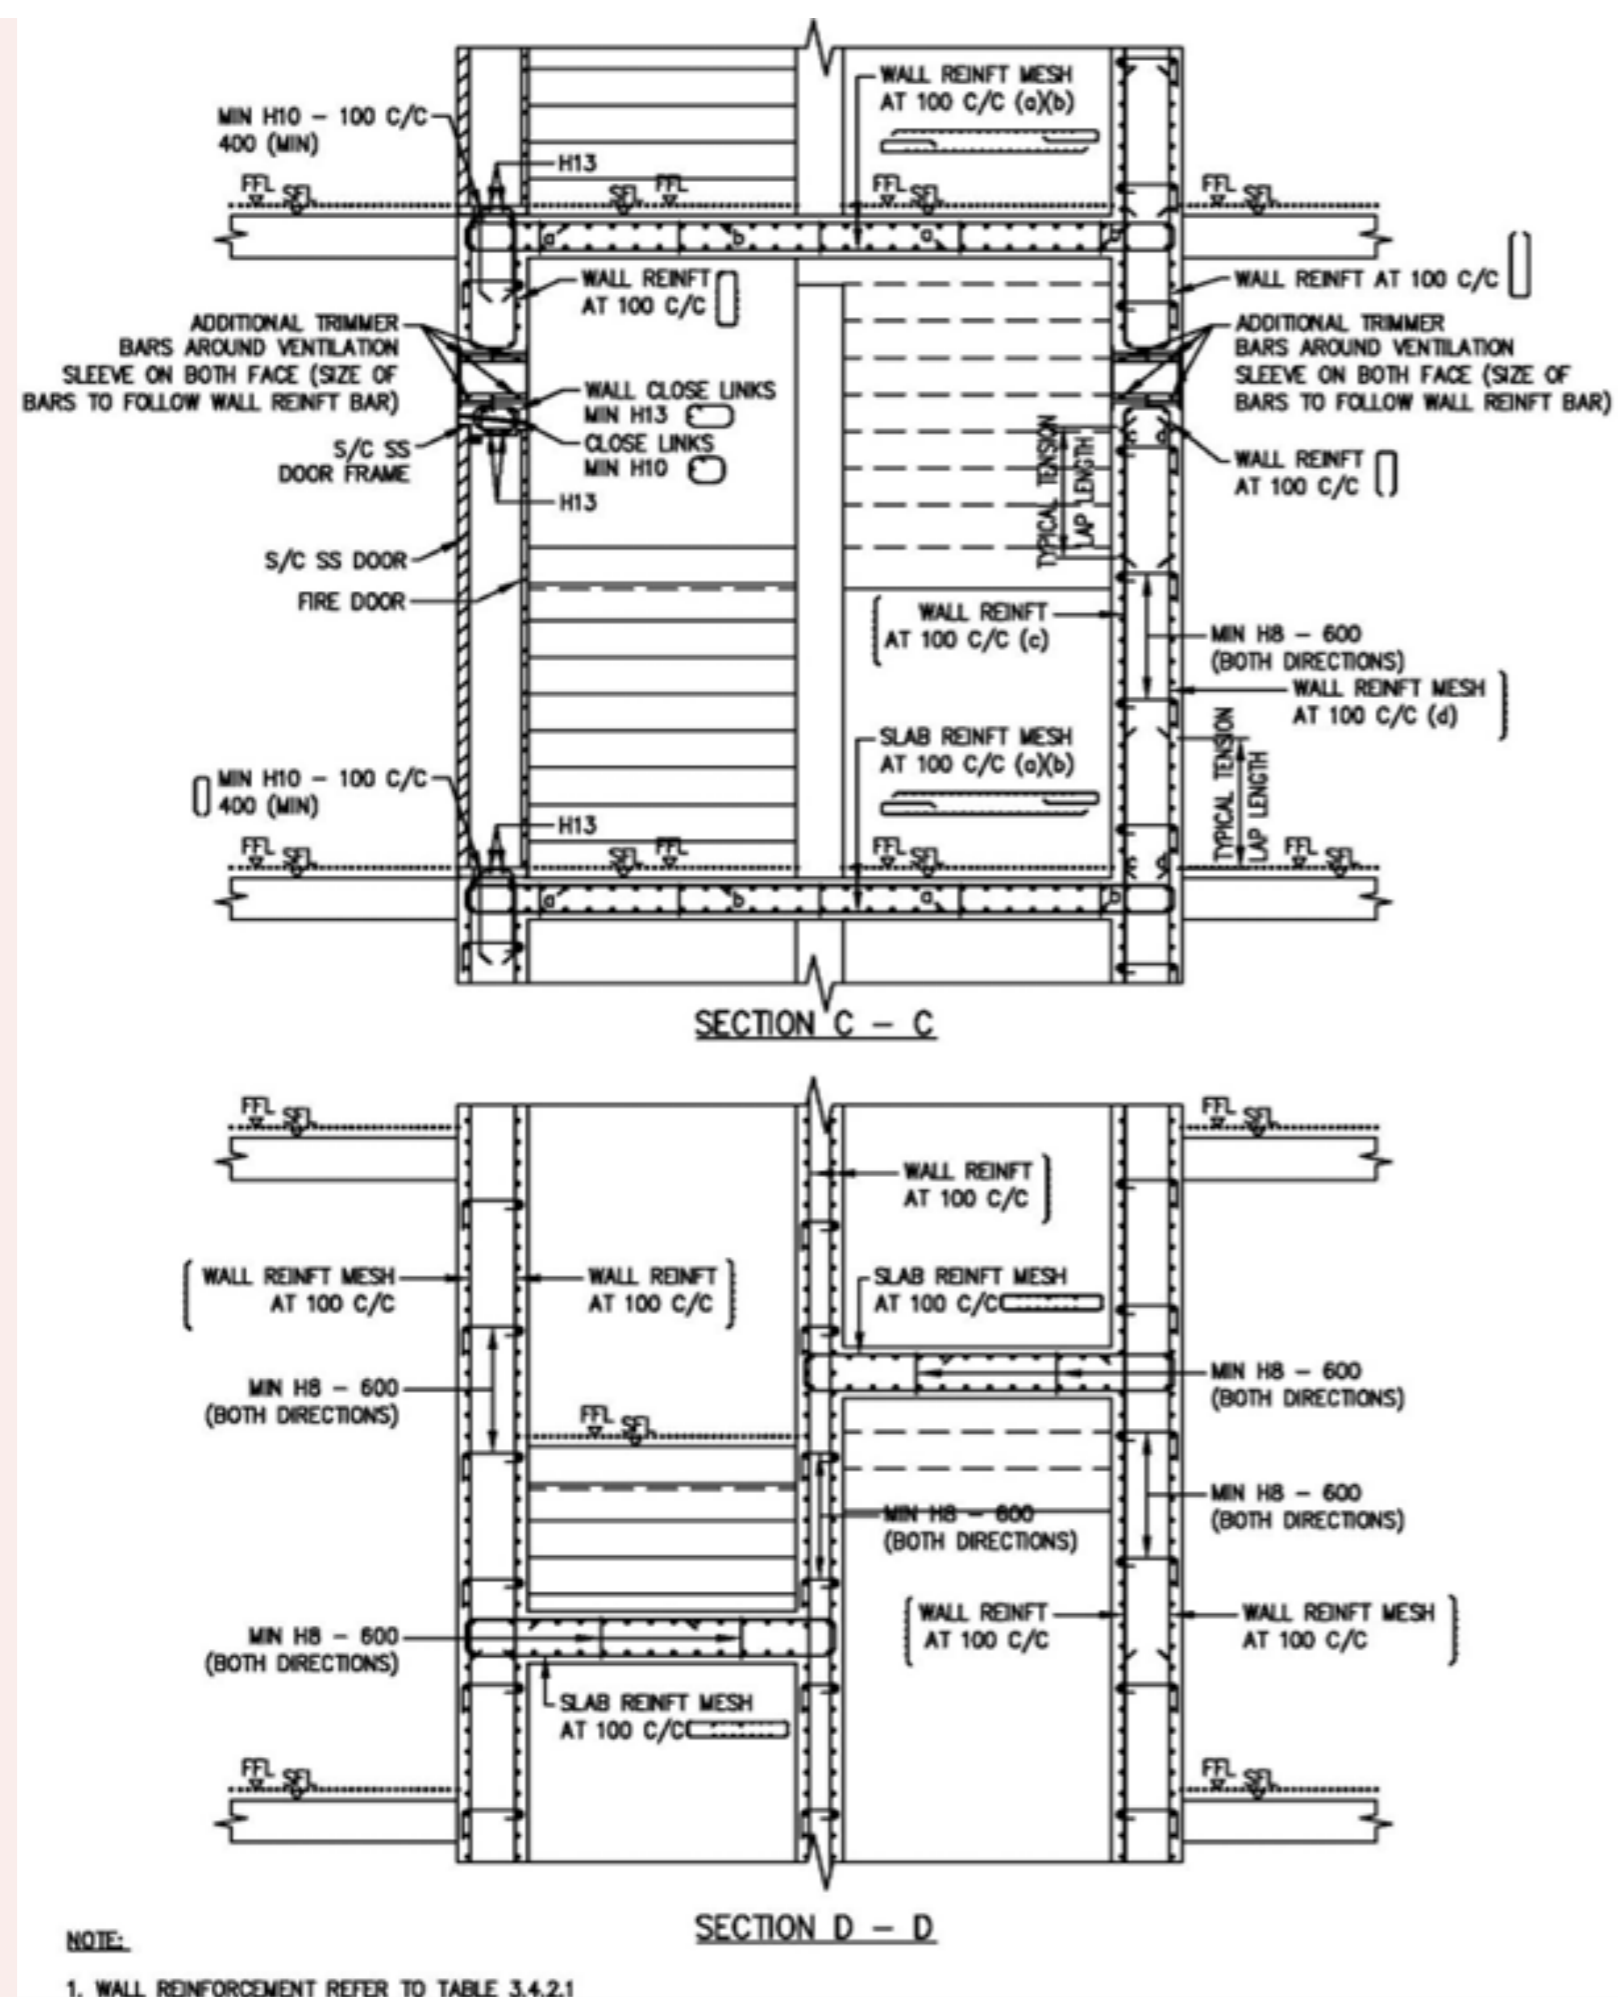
(m): SECTIONAL DETAILS OF SS SLABS/ WALLS FOR S/C SS
